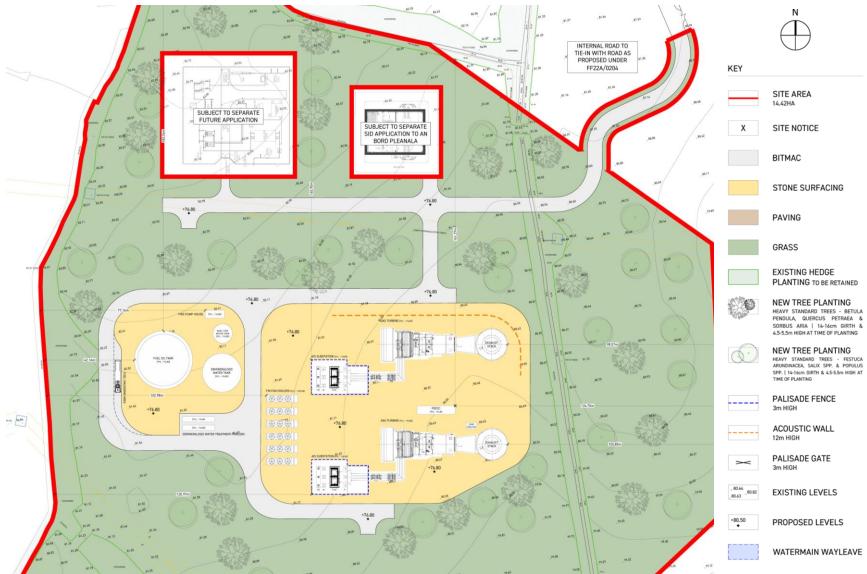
Proposed site plan (See drawing set for full resolution version)
